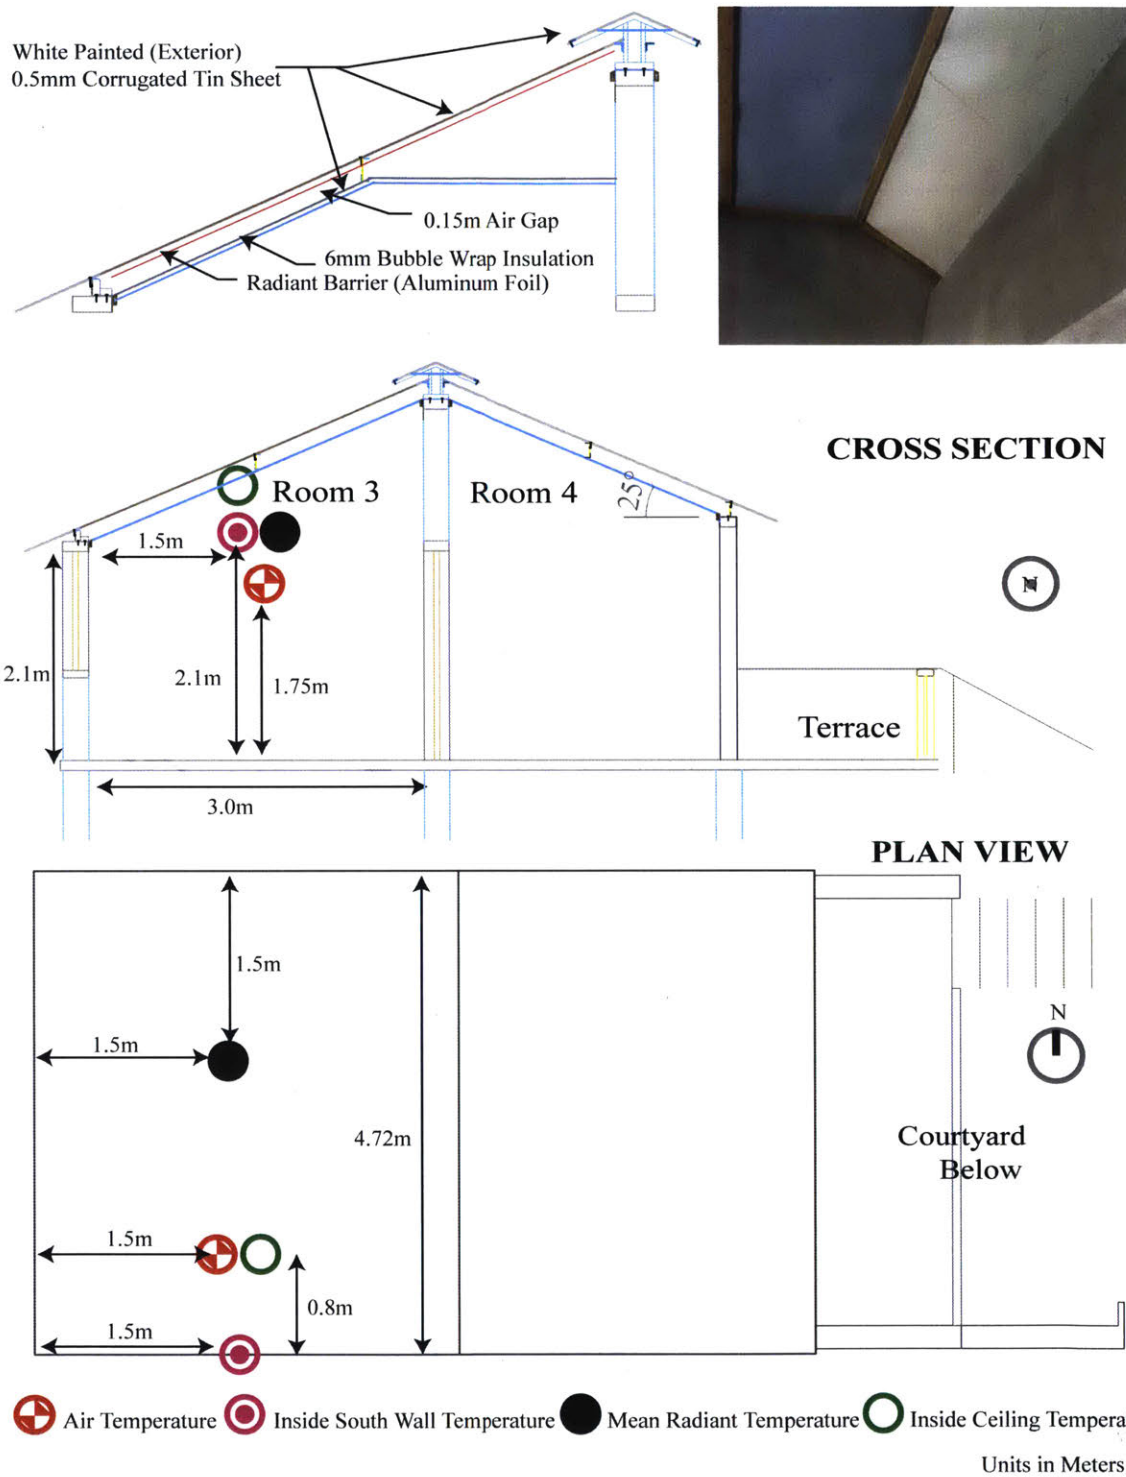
Roof Design and Sensor Locations in Home with a Double Layer Tin, Radiant Barrier, and Bubble Wrap Insulation Roof (H4) Image Adapted from Hunnarshala 2016
